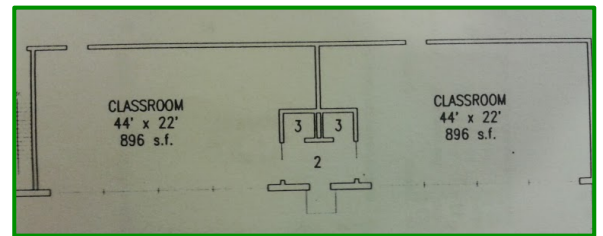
Floor plan excerpt showing Glenwood classroom/restroom layout.
